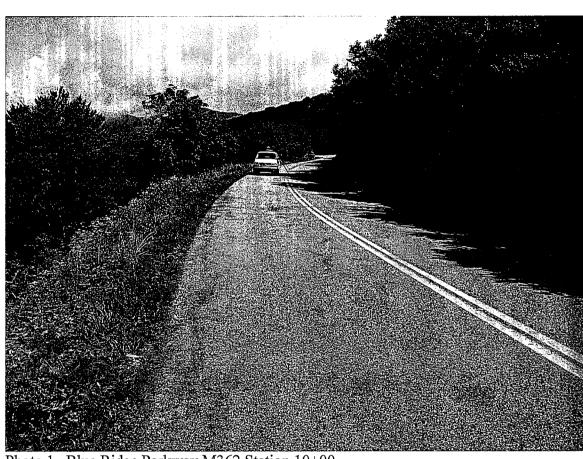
Blue Ridge Parkway M362 Station 10+00 No Distress
